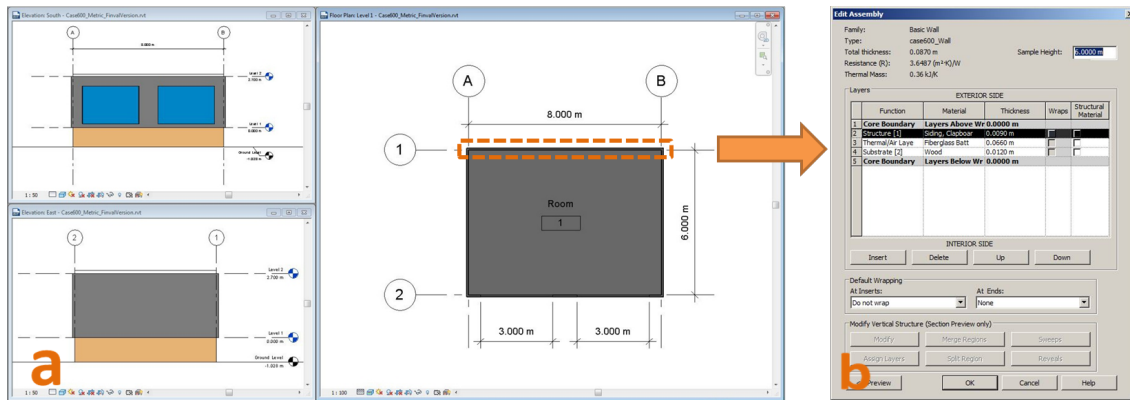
BIM in Autodesk Revit. (a) Elevation and floor-plan Views. (b) A wall assembly layers.
